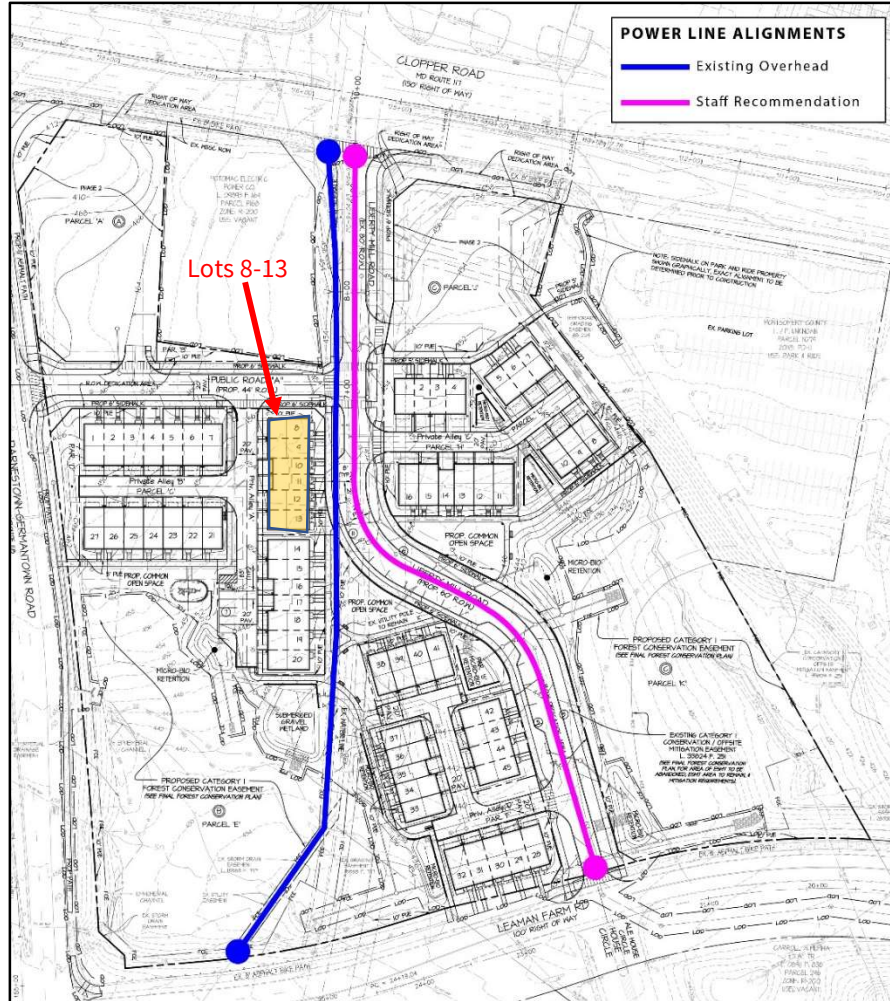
Existing Overhead Power and Staff recommendation for undergrounding
